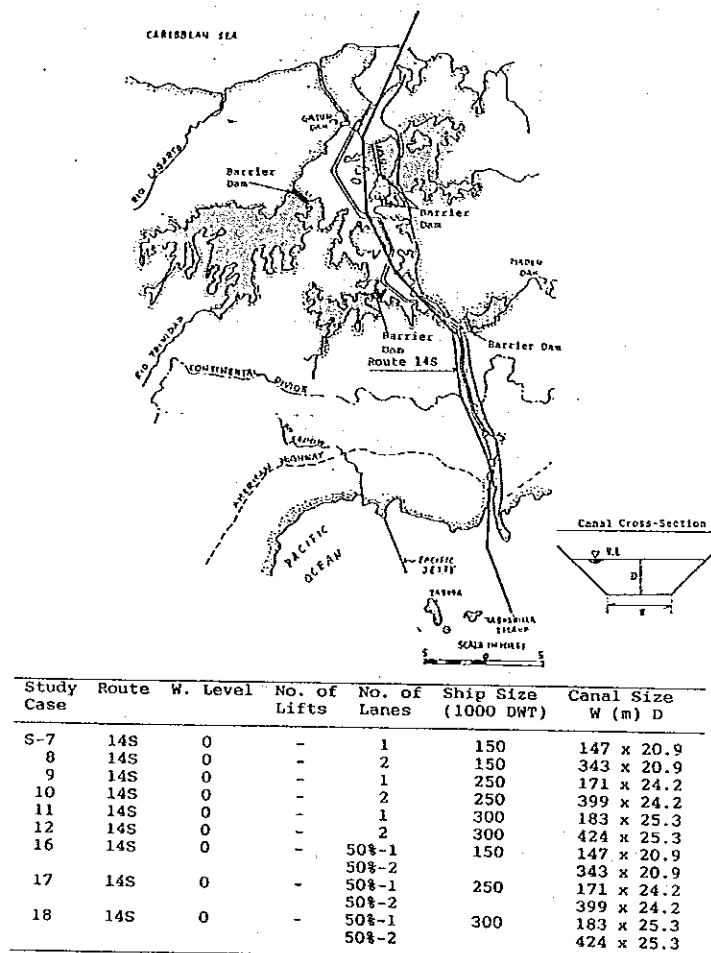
Layout of Sea Level Canal for Route 14S
